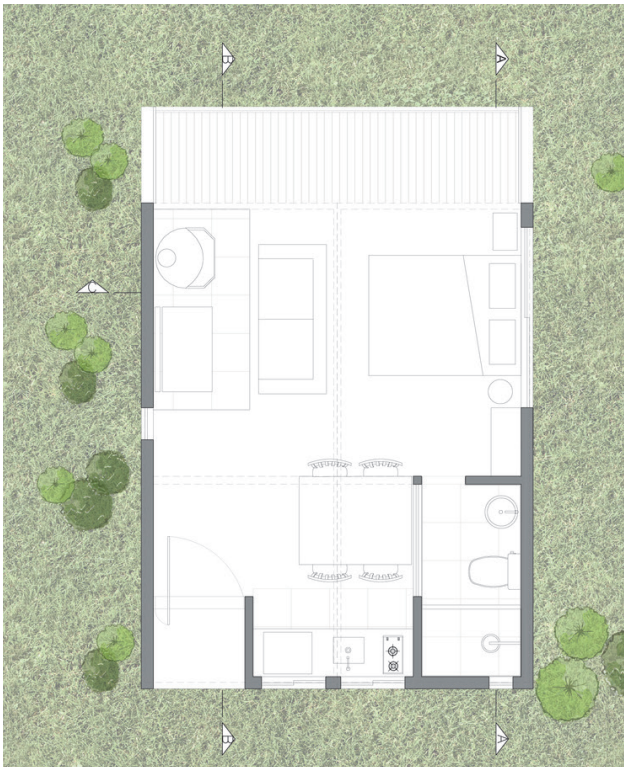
Cambara Container House, Floorplan (Jordani, 2020)
